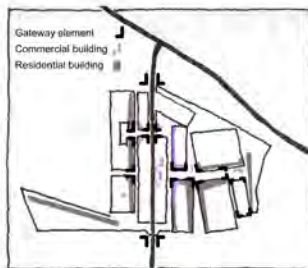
Edgemarking on public facing areas through the use of gateways, building 'pinch points' and strong street edge definition.
